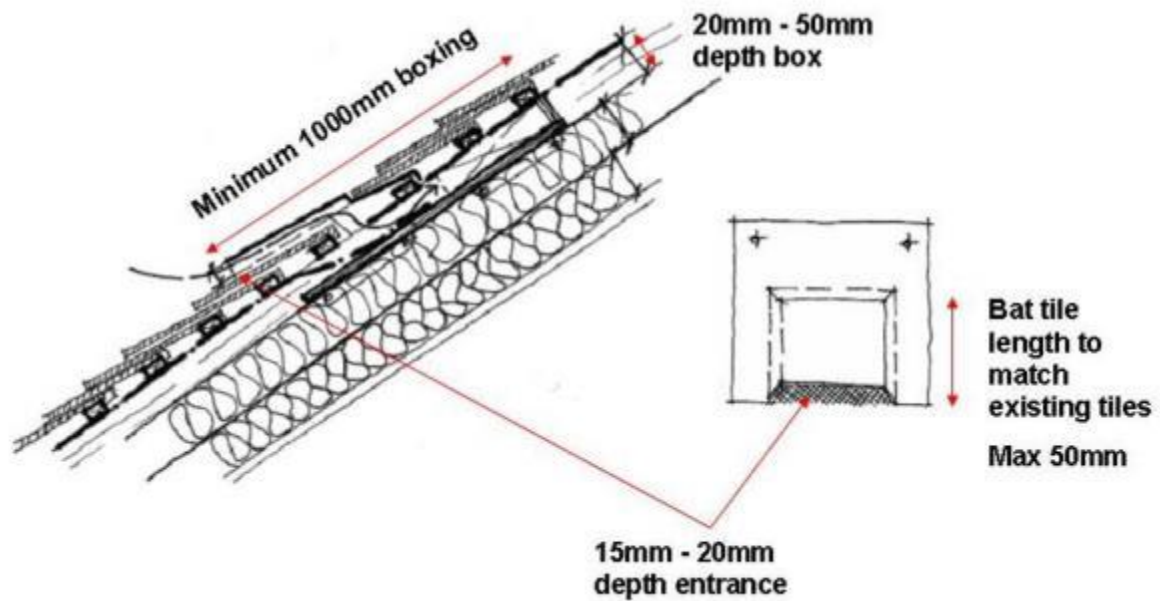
Crevice Dwelling Bat Boxes for Roofs and Walls
